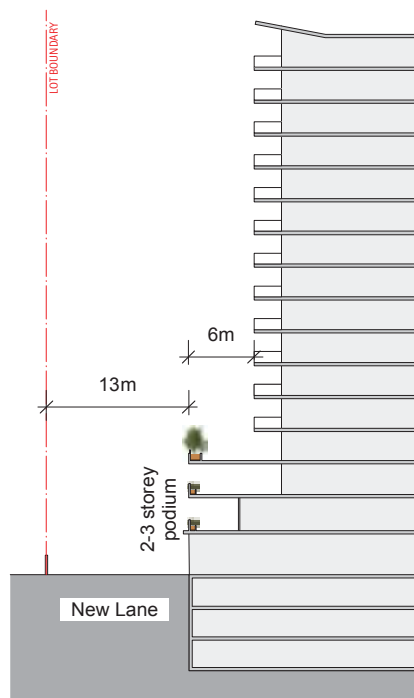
Setbacks to New Lane connecting Carlingford Road and Rawson Street
